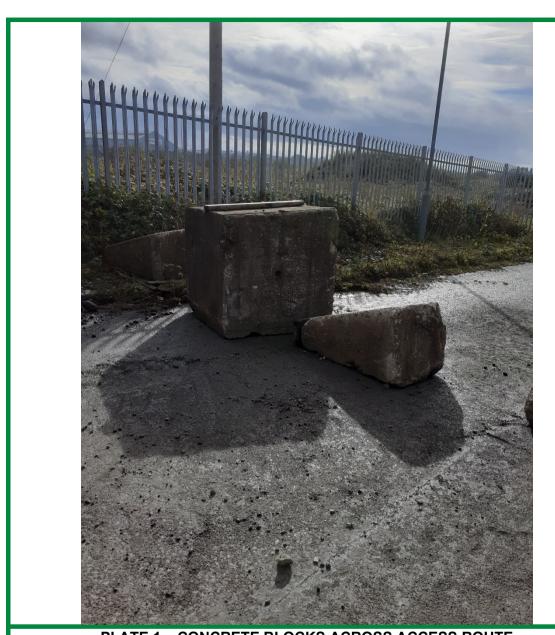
CONCRETE BLOCKS ACROSS ACCESS ROUTE
